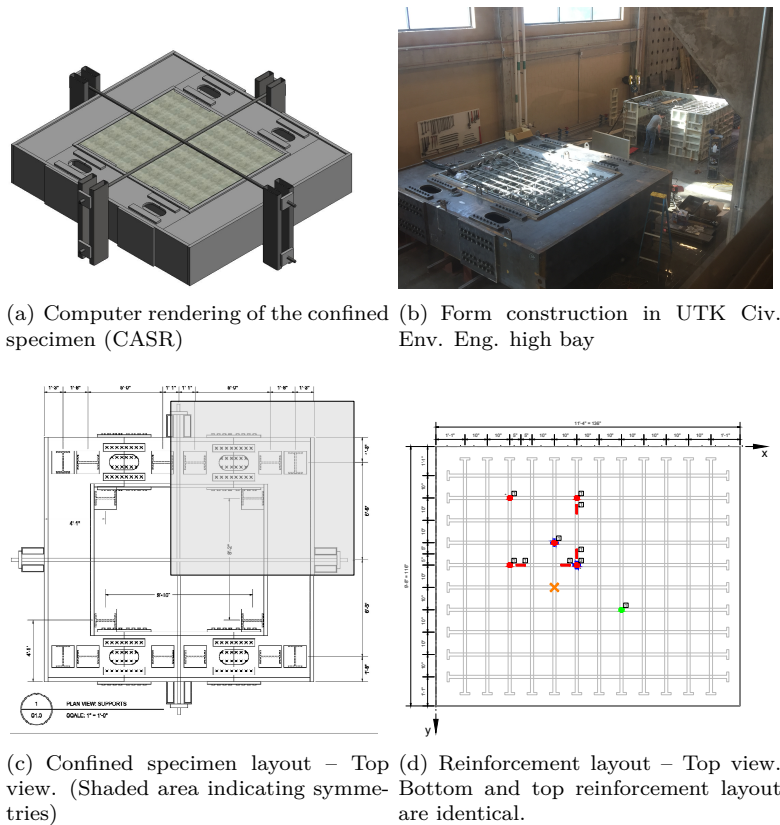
Reinforced concrete panel test problem (hayes2018monitoring)
